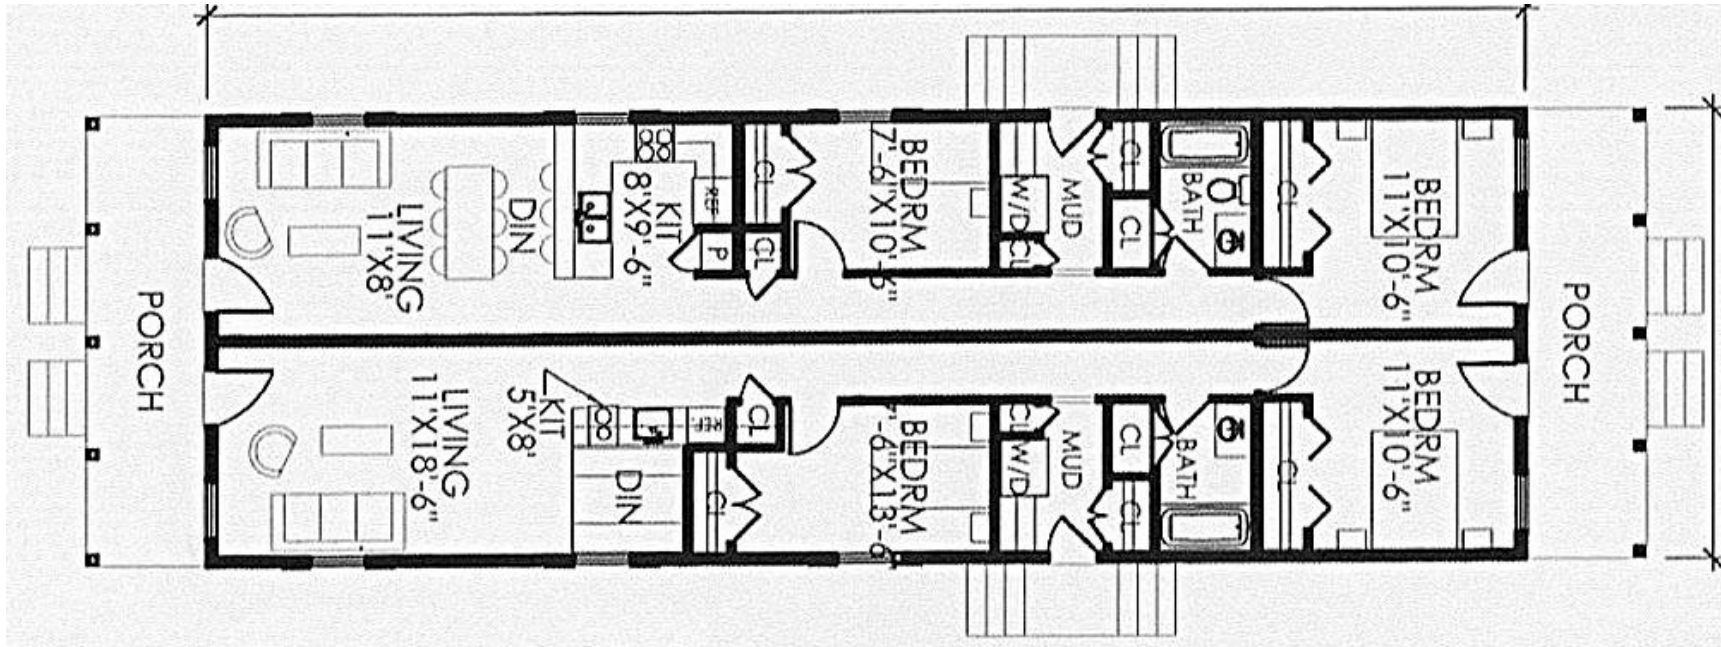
Plan view of a four-bay, double barrel shotgun house.
